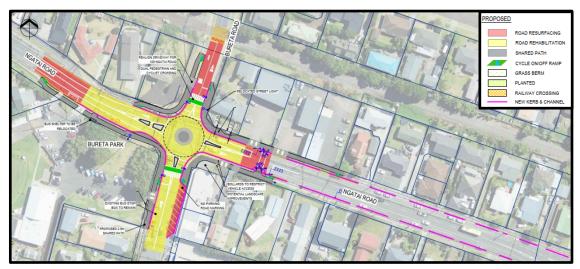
Proposed layout of the Ngatai/Bureta Road Roundabout
